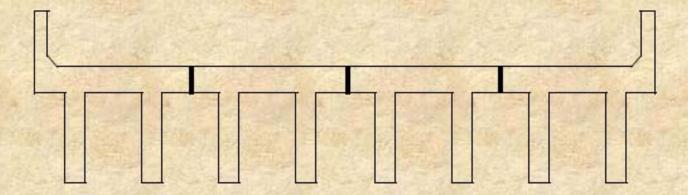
Integral Concrete Slab with Precast Concrete Double Tee Sections with Shear Keys and Transverse Post-Tensioning.
